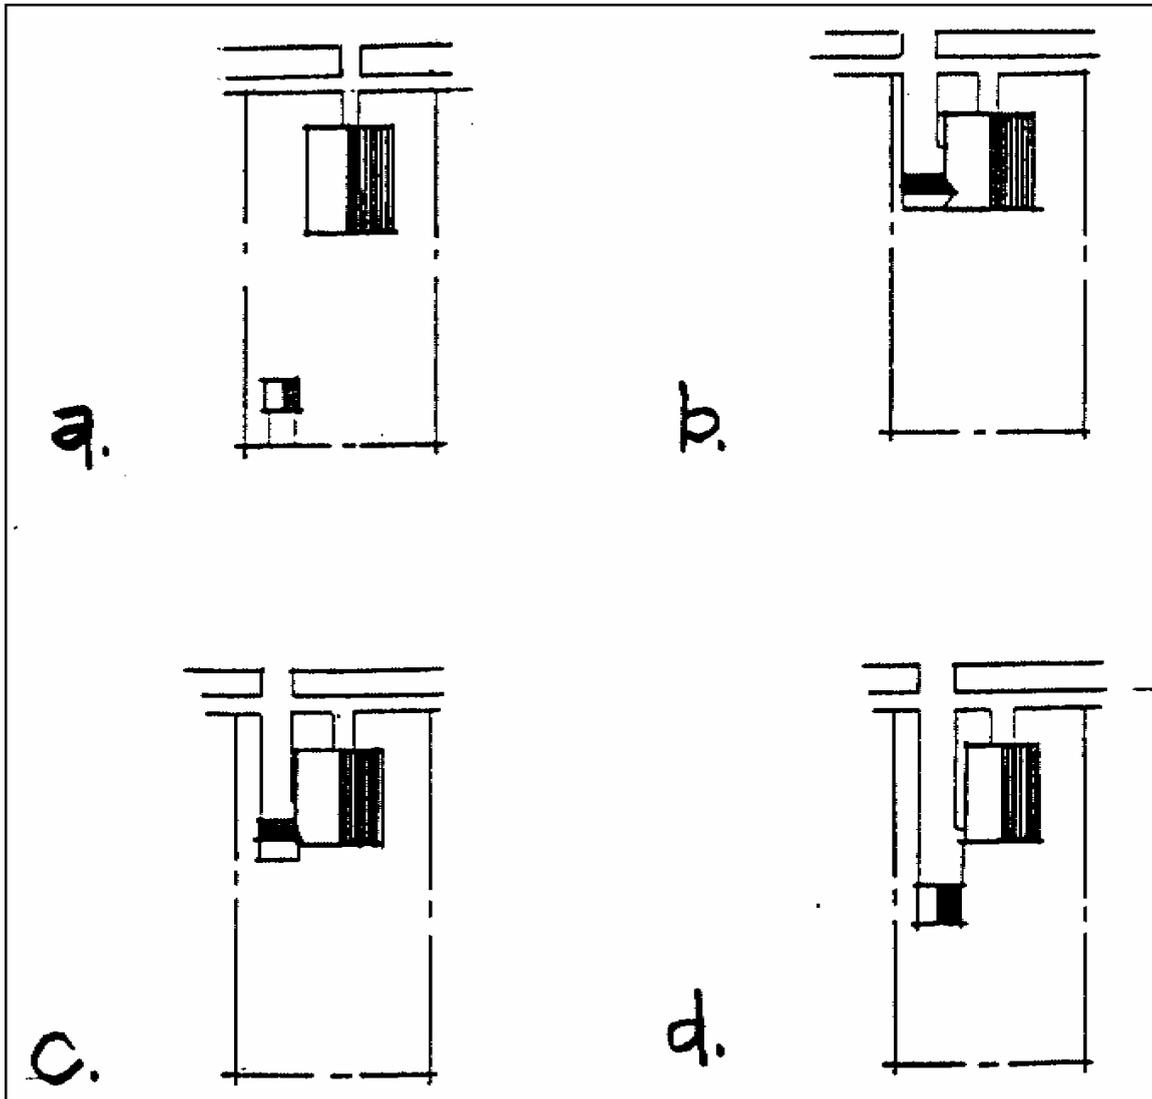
Plan-view diagrams of four alternative garage locations on a single-family housing lot: a) detached garage is accessed from an alley; b and c) attached garage is accessed from the local street, d) detached garage, behind the house, is accessed from the local street.
